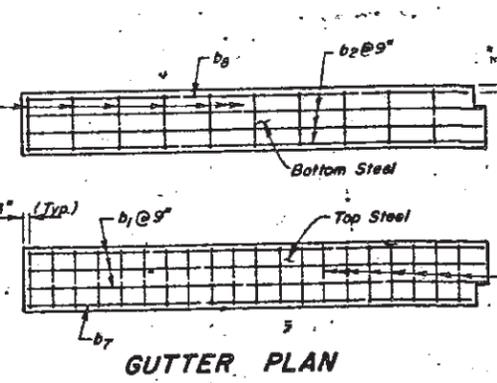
DETAILS OF STANDARD SUPERSTRUCTURE FOR
